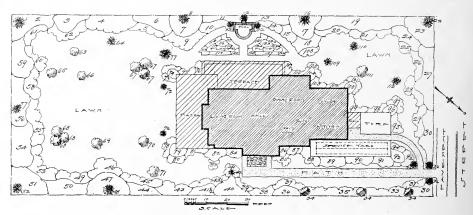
Plan for residence on a lot 90 ft. x 200 ft., kitchen wing toward street screened by plantings, living room facing southeast with a view over the lawn. The fountain and pool is an interesting feature.
